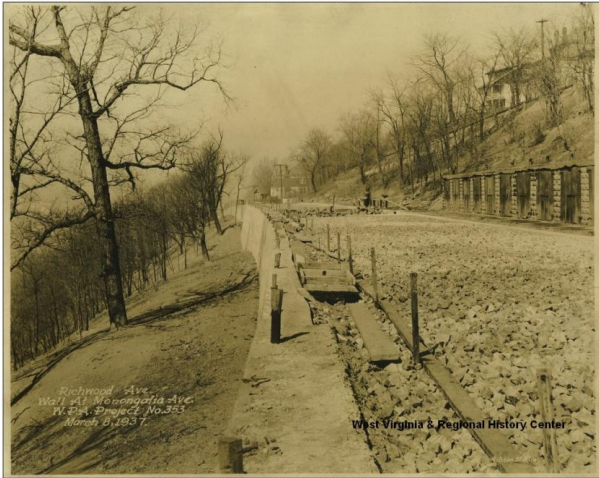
Richwood Avenue Wall at Monongalia Avenue
